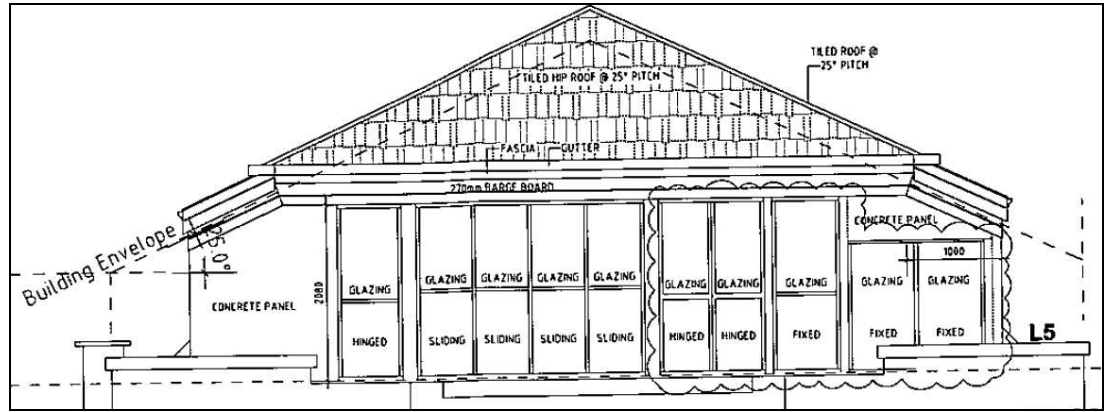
Building height envelope and as-constructed building height - Front elevation.
